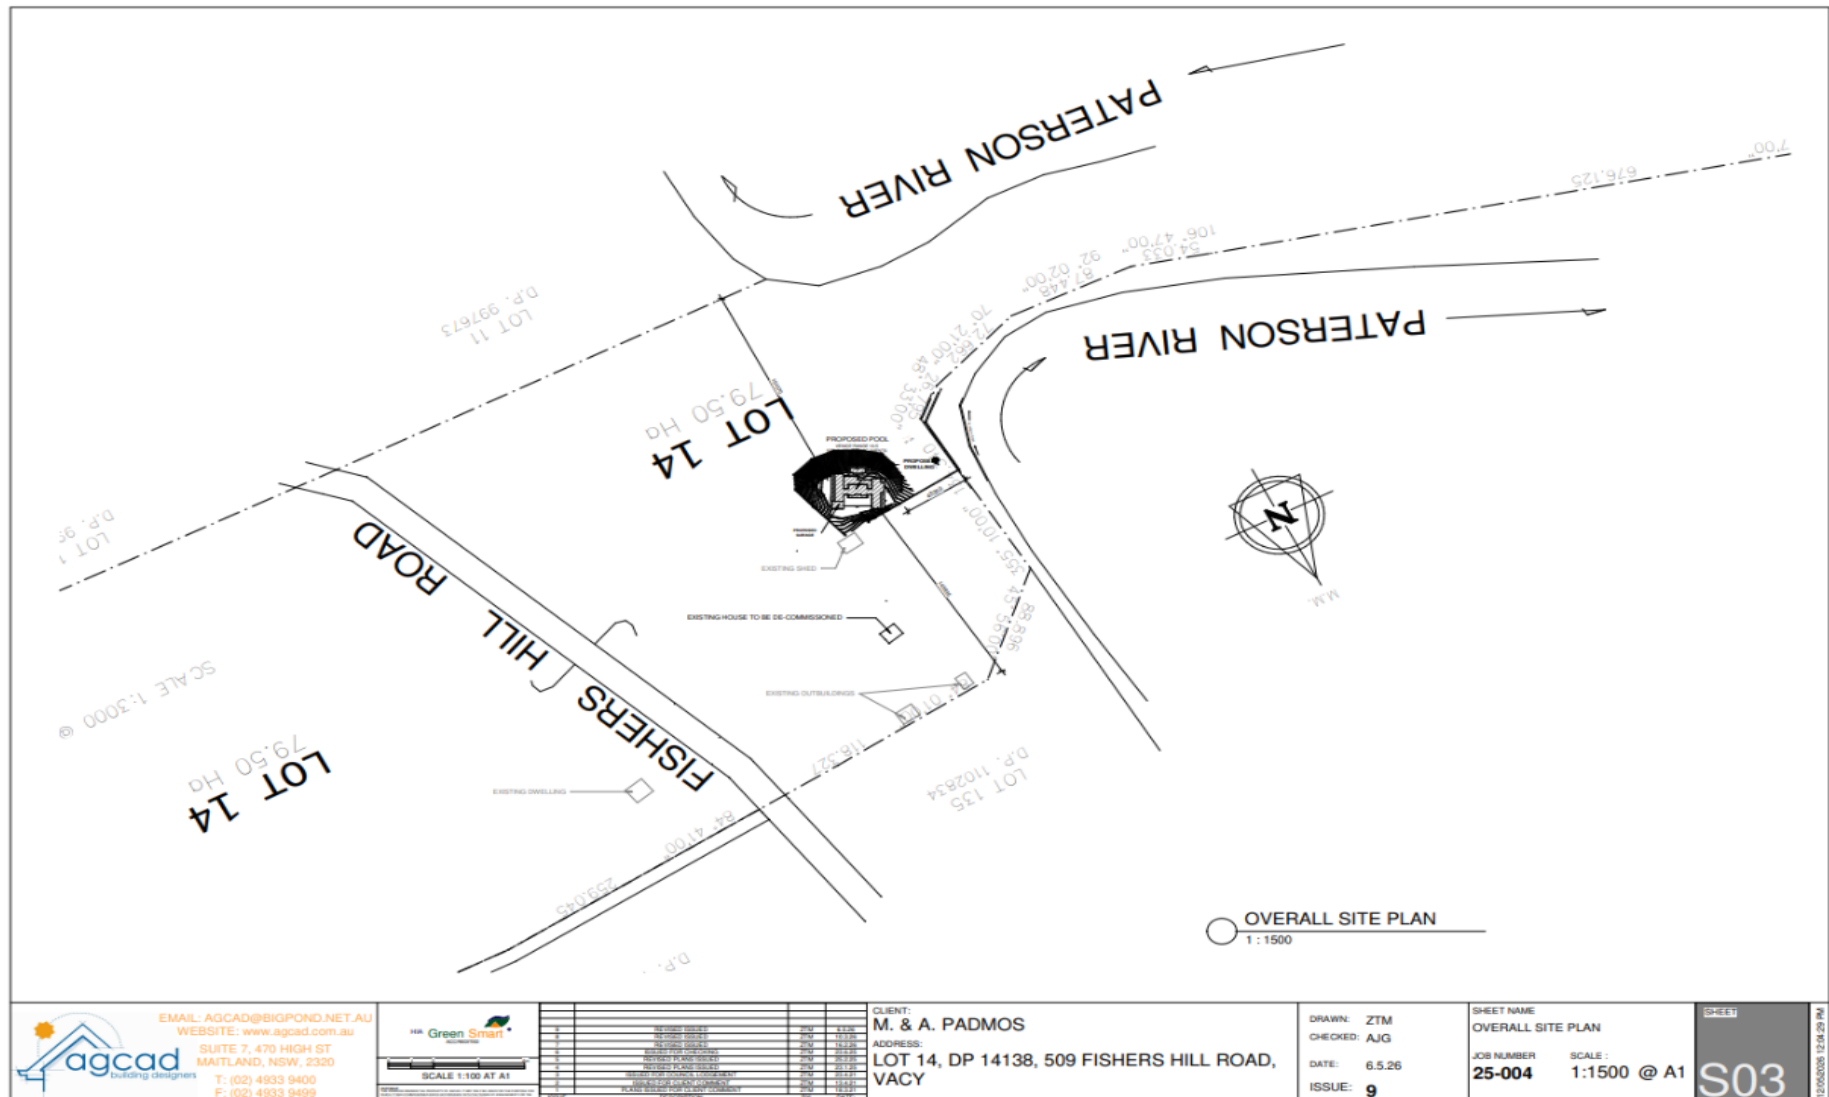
Site plan of proposed development (source: Agcad, 2026)
